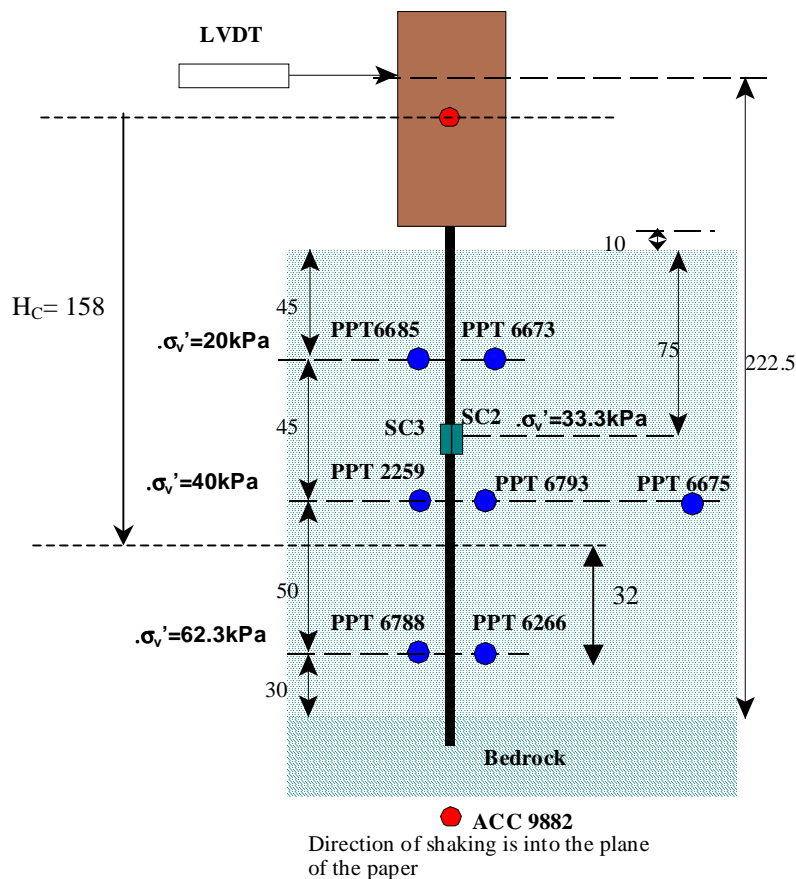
Instrumentation layout surrounding Pile 10 (all dimensions are in mm).
